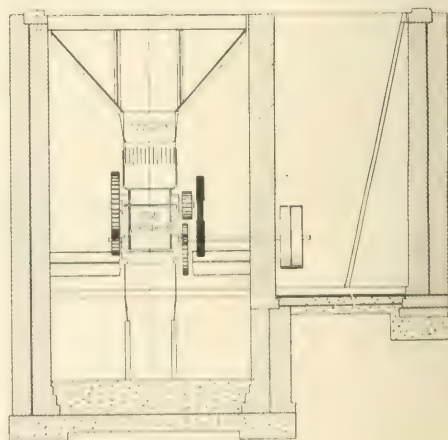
ARRANGEMENT OF BREAKER PIT AND ROOF OF ELEVATOR.
